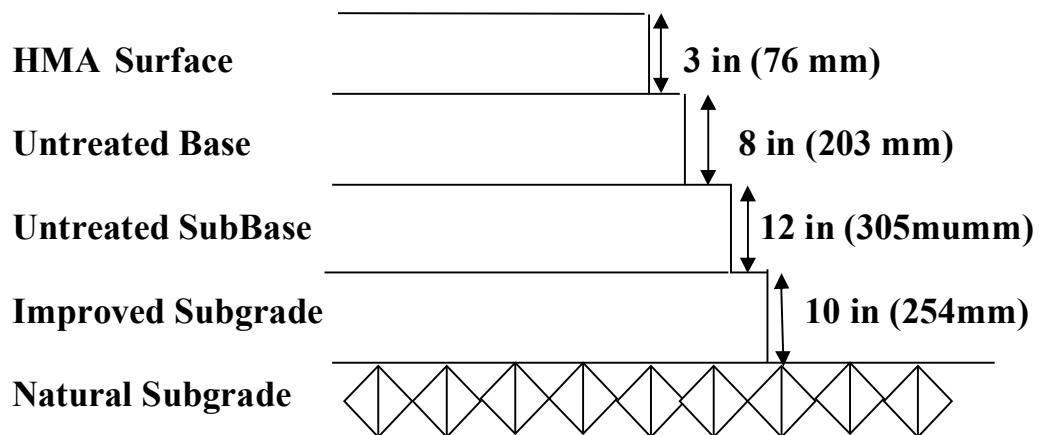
Pavement Layers Thickness According to AASHTO Design Method for Road A
